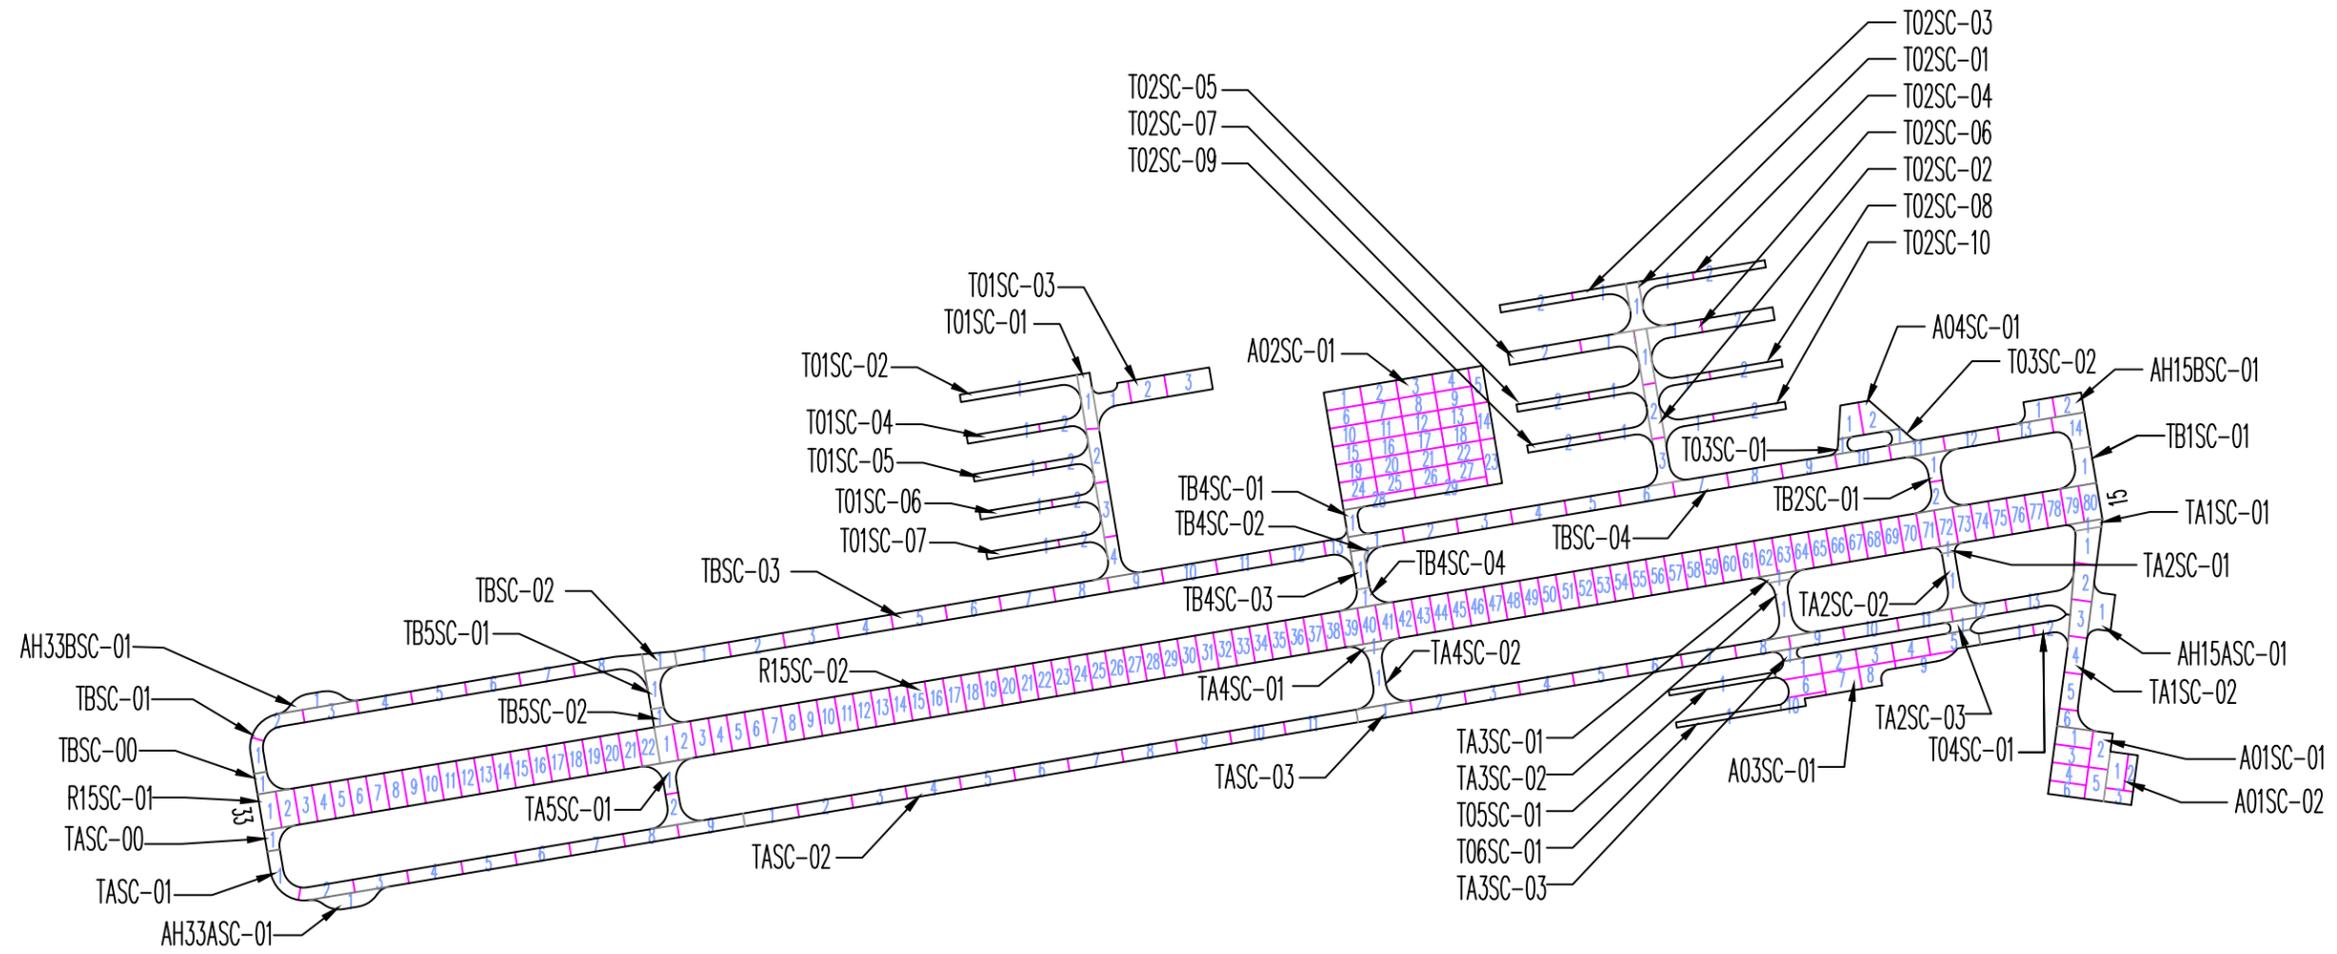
Pavement Branch, Section and Sample Unit Layout.
